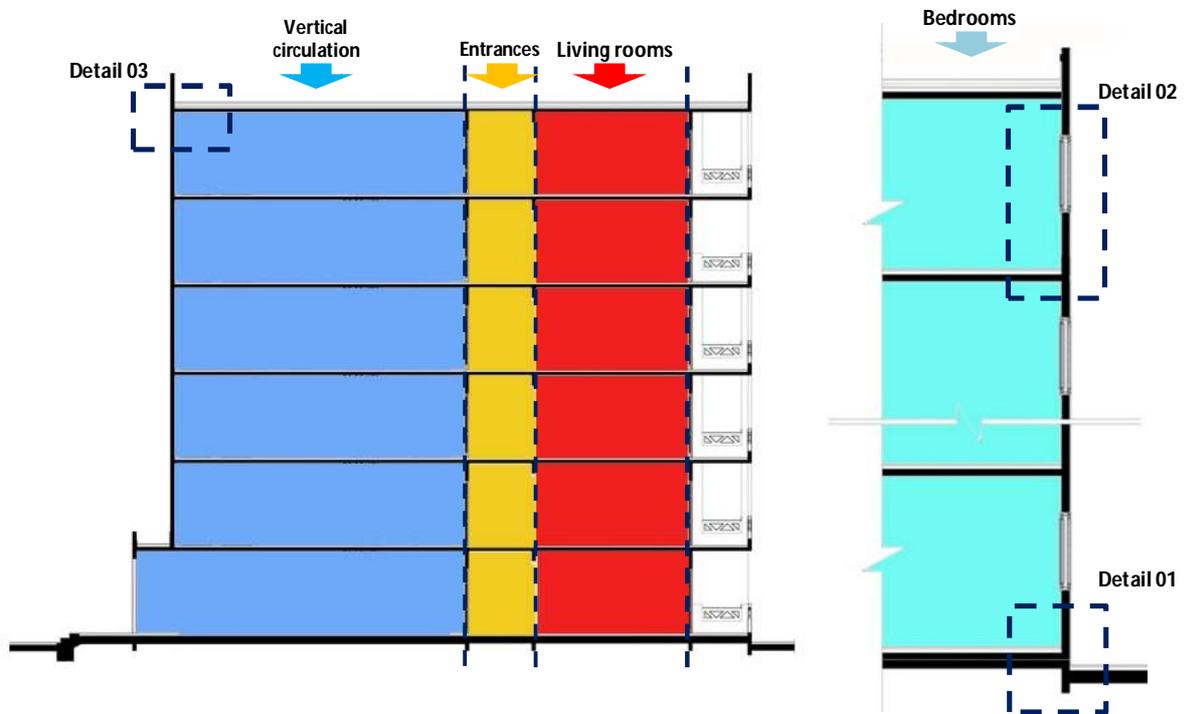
Section B-B (on the right) and wall section C (on the left)
